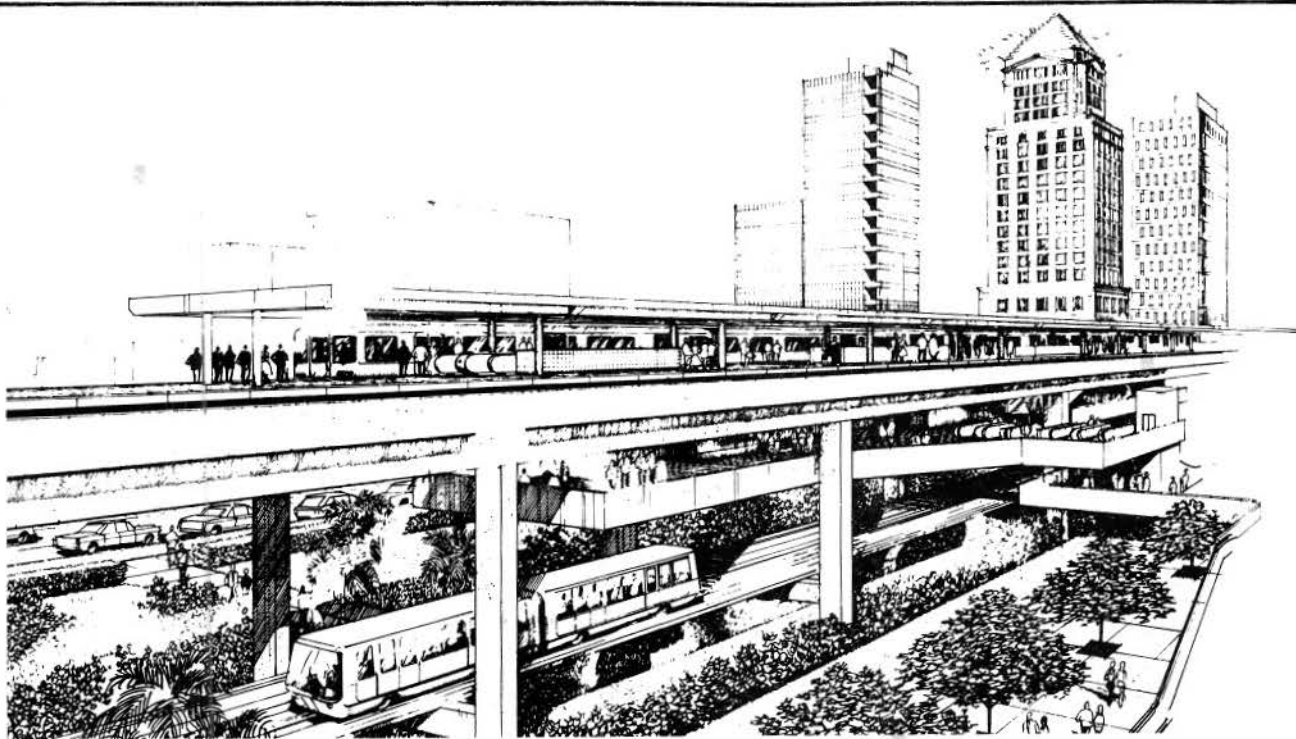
ARTIST'S SKETCH STATION 'G' LOOKING SOUTHEAST
